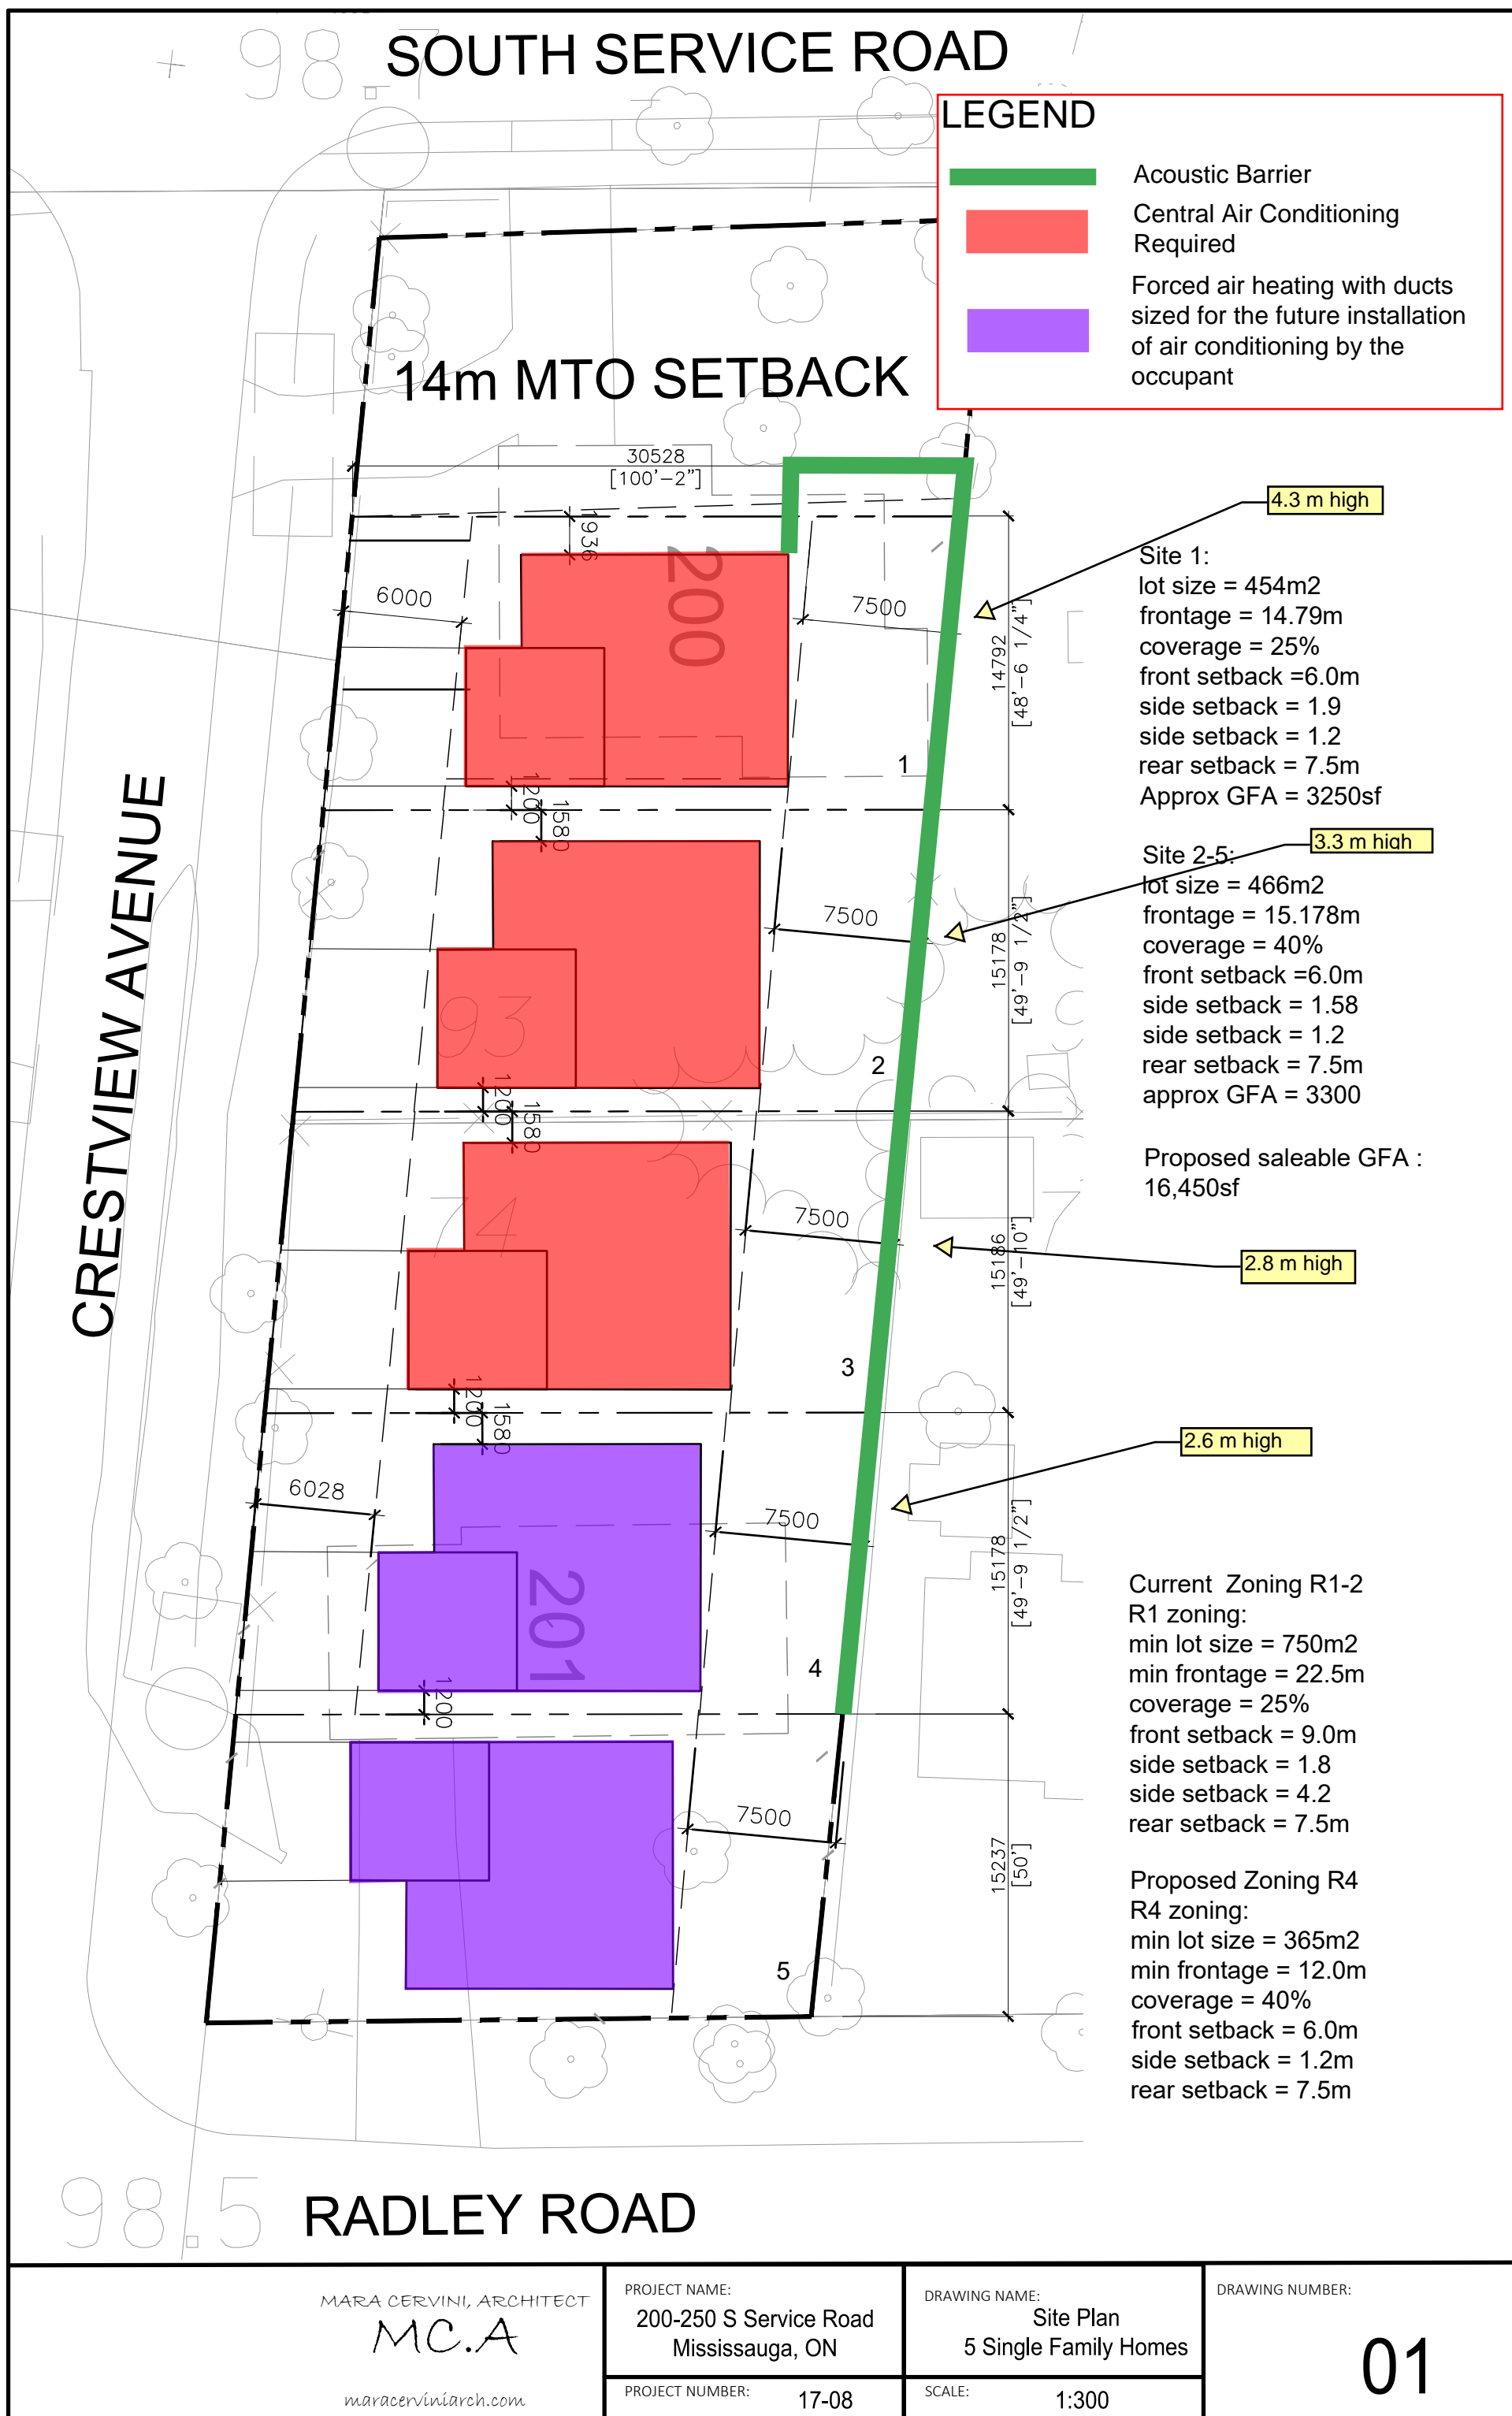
Proposed Site Plan showing Ventilation and Barrier Requirements
